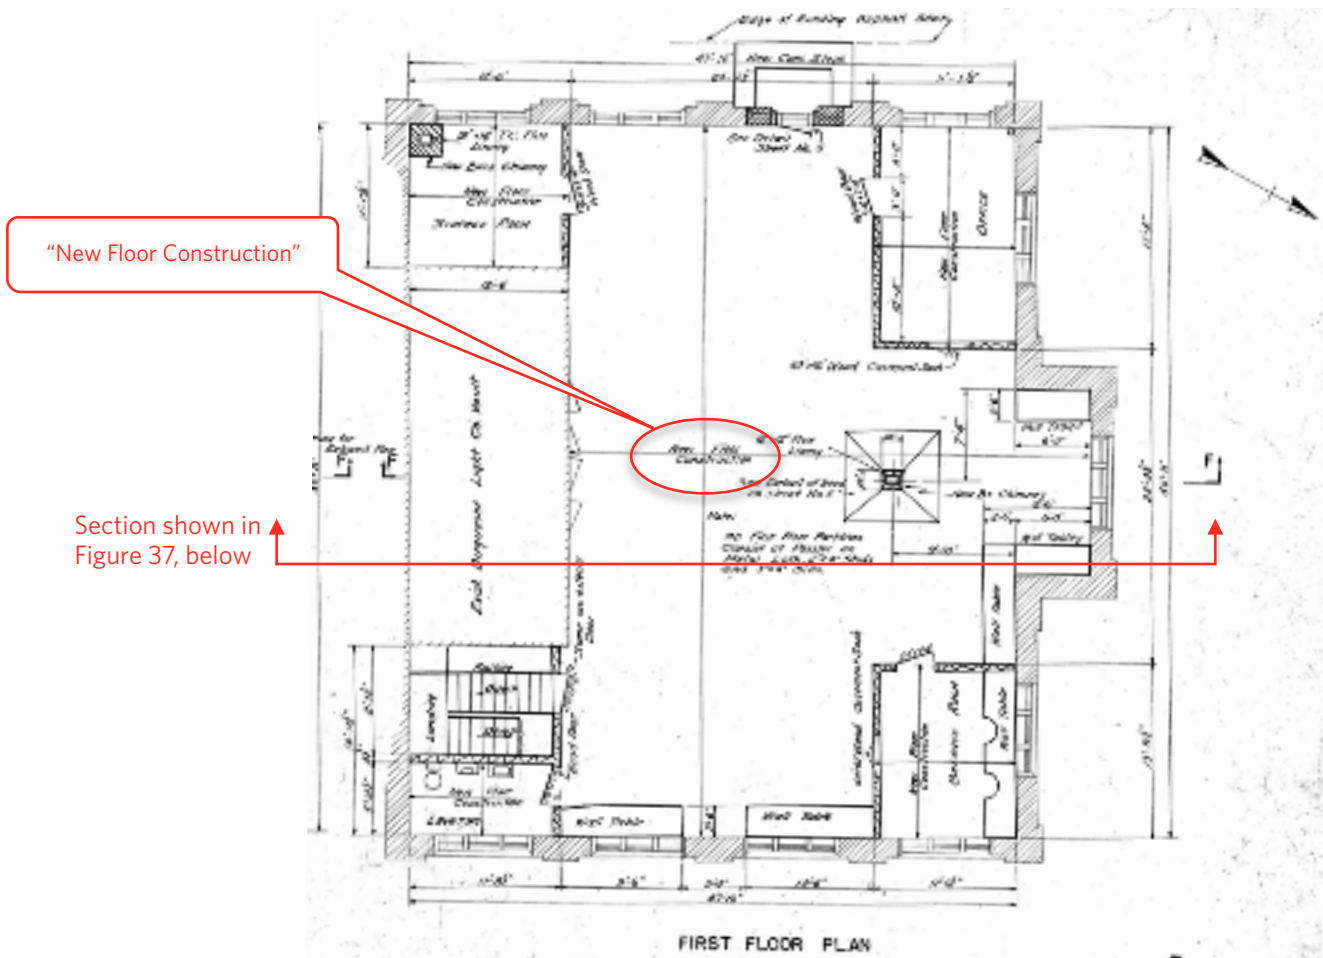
Plan of the new first floor of the Boiler House from 1939 construction drawings (City of Pittsburgh, Department of Public Works).
